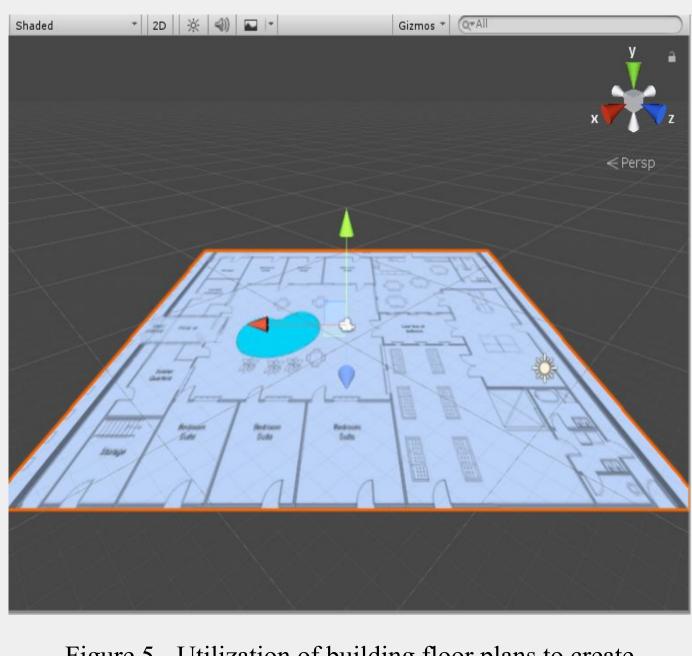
Utilization of building floor plans to create model paths for indoor navigation
